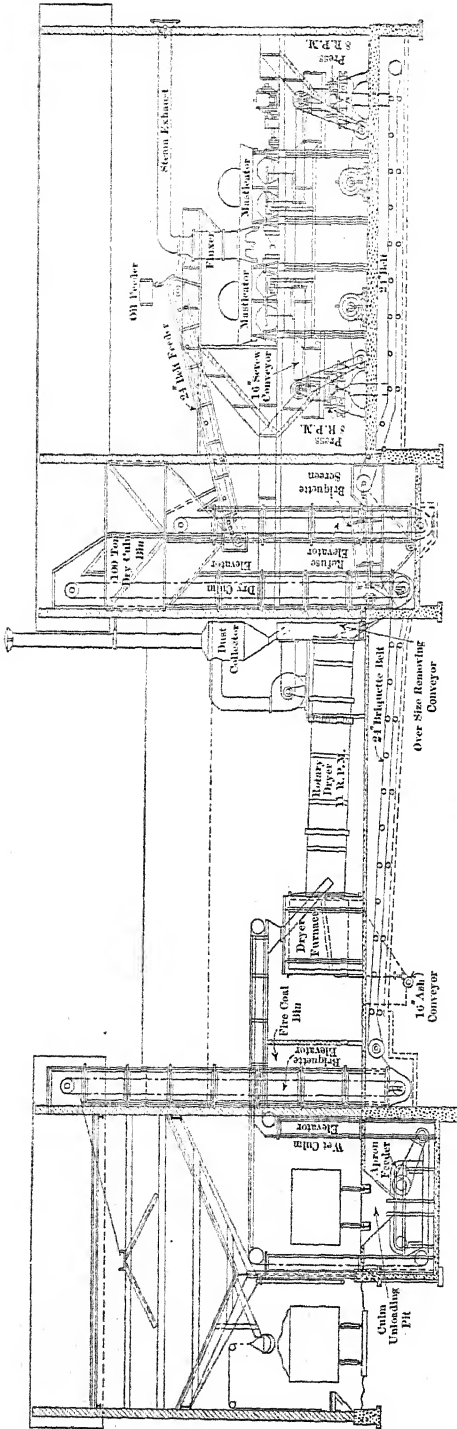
LONGITUDINAL SECTION OF PROPOSED LANSFORD COAL-BRIQUETTING PLANT.
